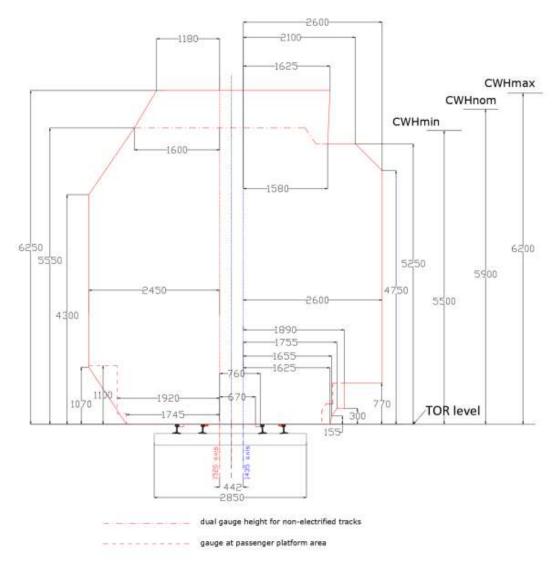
GAUNTLET TRACK STRUCTURE GAUGE FOR 1520 AND 1435 MIXED TRAFFIC SECTIONS
